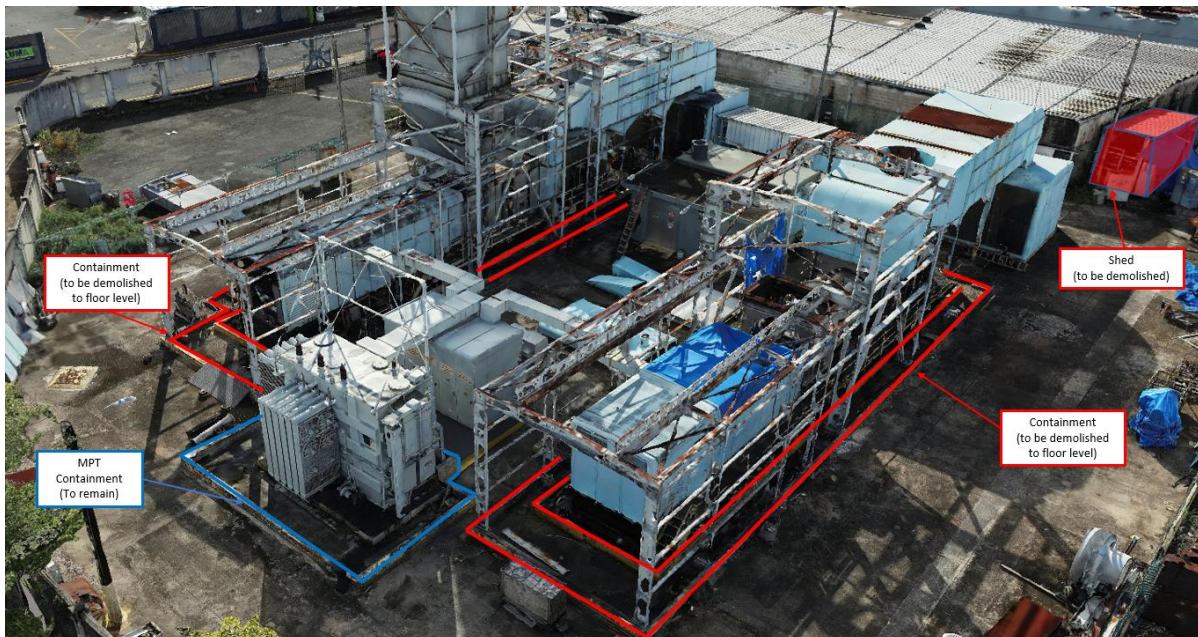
Plant Materials, Equipment and Structures to be Demolished
